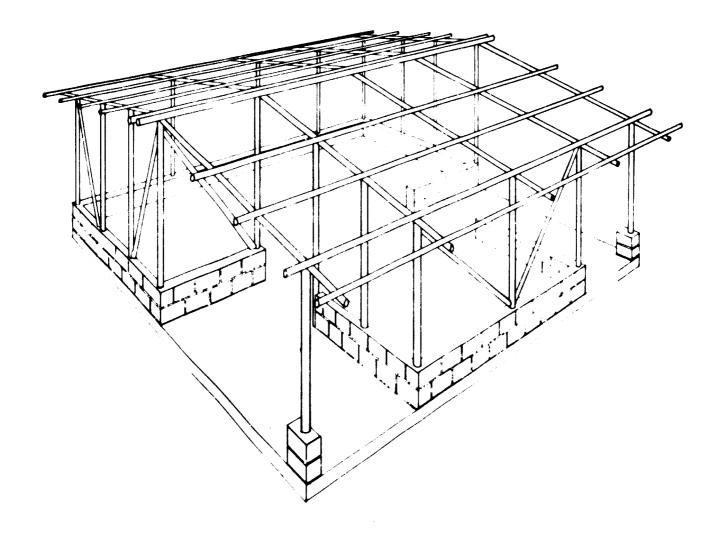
Round wood pole frame construction, over a low concrete-block wall, used in a self-help housing project in Panama.
